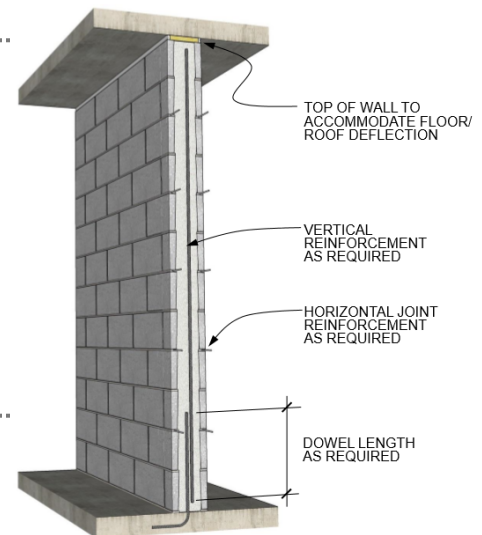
Cantilevered Wall Detail from IMI Masonry Detail Series, <http://imiweb.org/masonry-detailing-series/>
